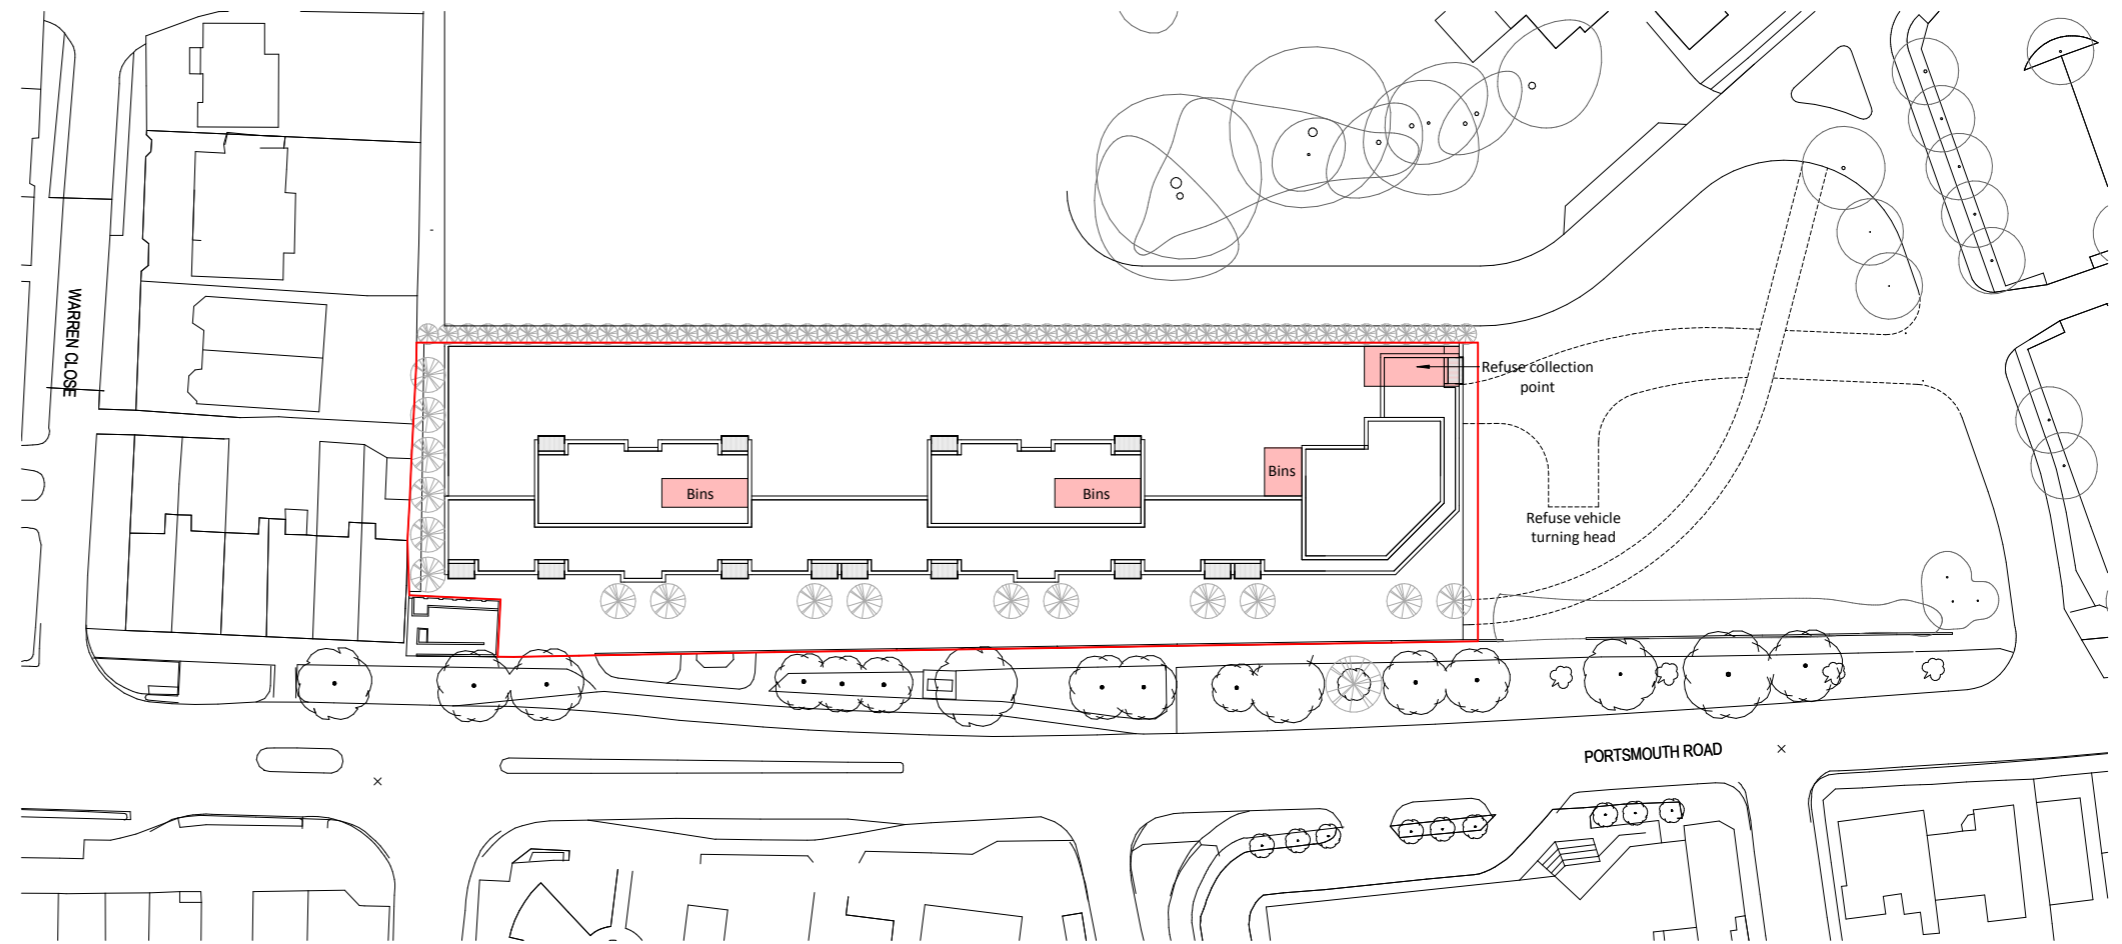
Illustrative Refuse Strategy Layout Site 2
